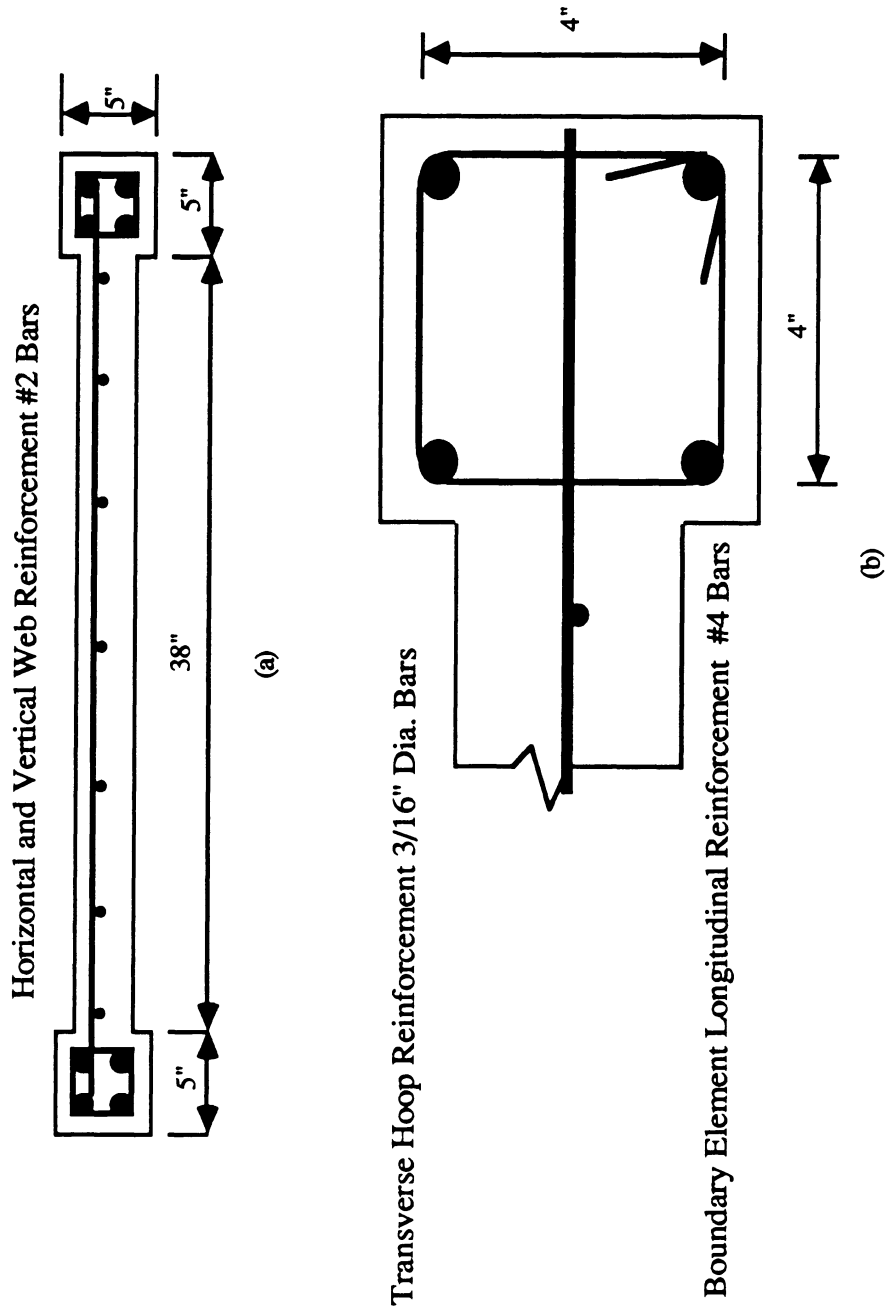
(a) Typical Cross-Section of Specimen.
